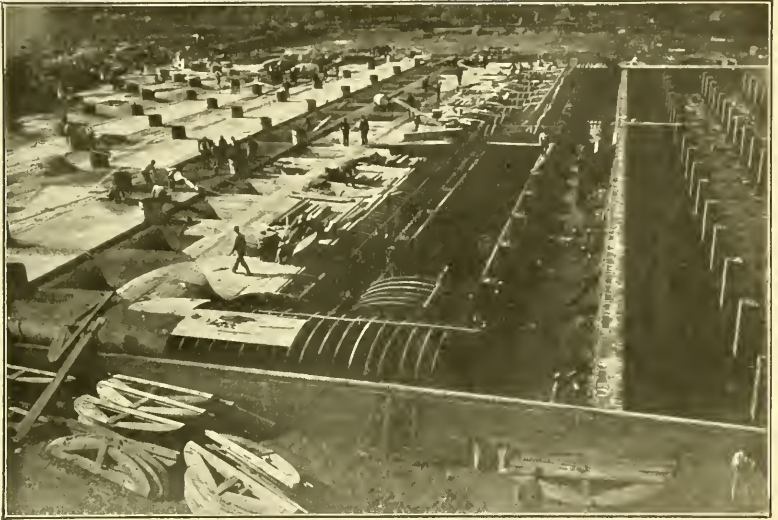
GENERAL VIEW OF VAULTING, UNDER CONSTRUCTION.
